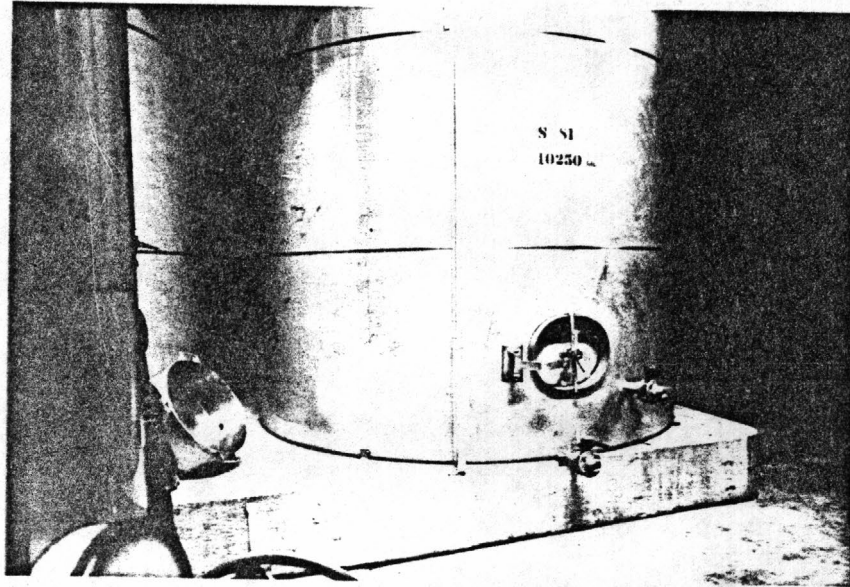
Photograph inside the Emilio Guglielmo Winery, 1480 Main Street (location 18). Photograph shows 10,250 gallon storage tank that was welded to catwalk support which in turn was bolted into the concrete pad. This stainless steel tank rotated 2.5 cm (1 inch) counterclockwise (to the right), the catwalk was mildly wrenched. This tank was empty. Other tanks that were filled to capacity and developed elephant toe bulges over consistent azimuthal arcs while shifting on the same concrete pad.
